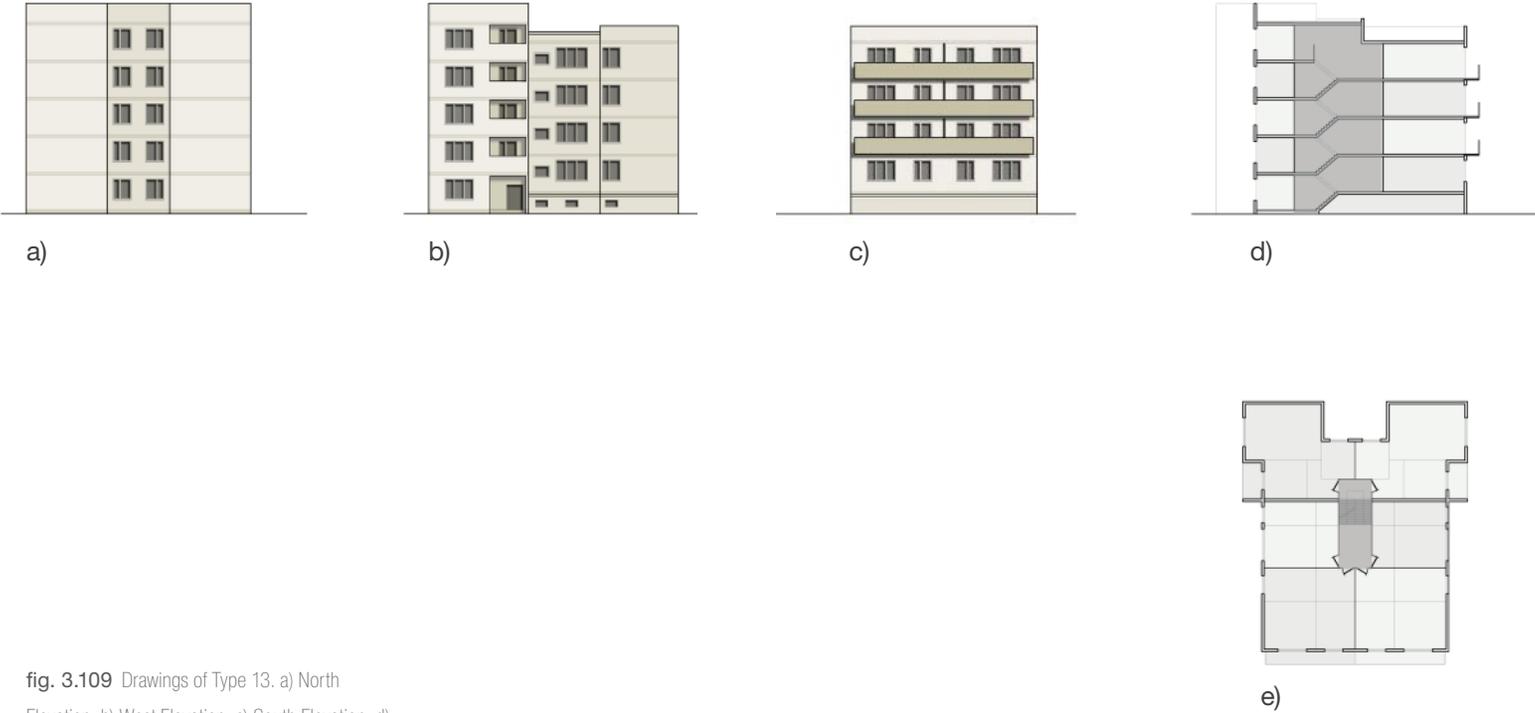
Drawings of Type 13. a) North Elevation, b) West Elevation, c) South Elevation, d) Typical Section, and e) Typical Plan. 1:500.
